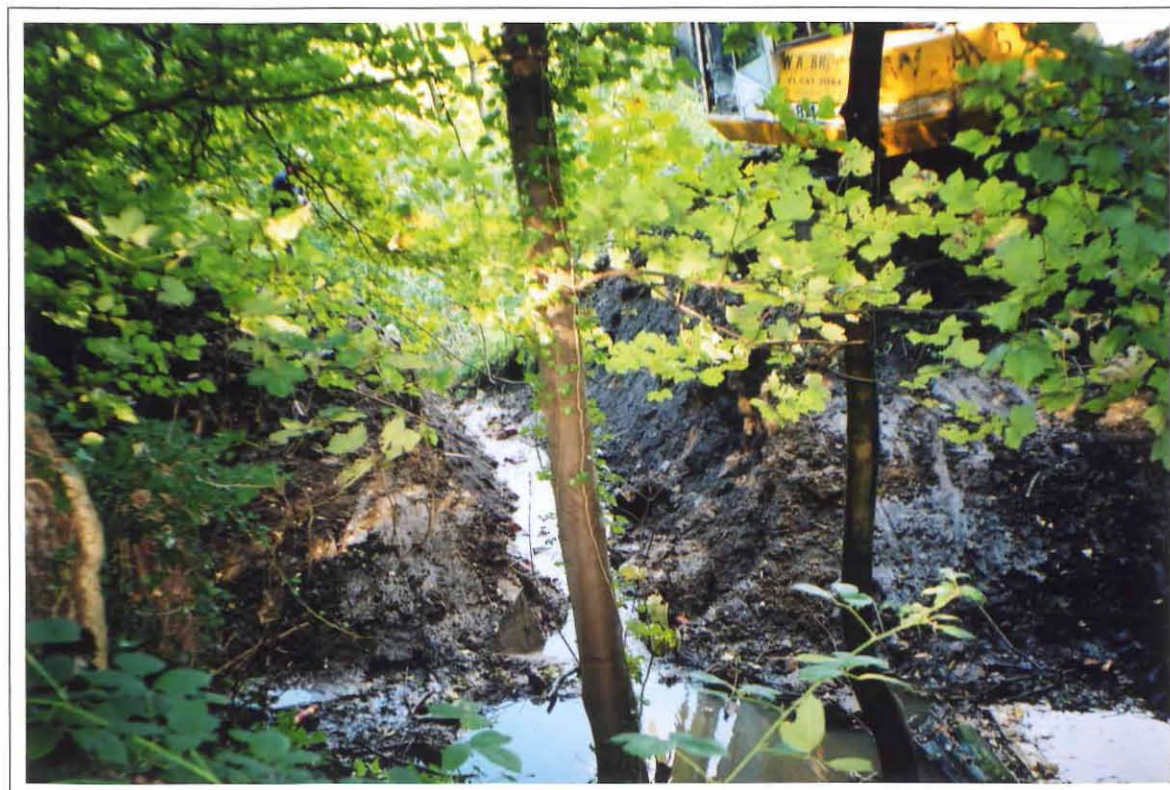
Excavation of drain on the side of ponded area. Photo CPAT 1107.18
